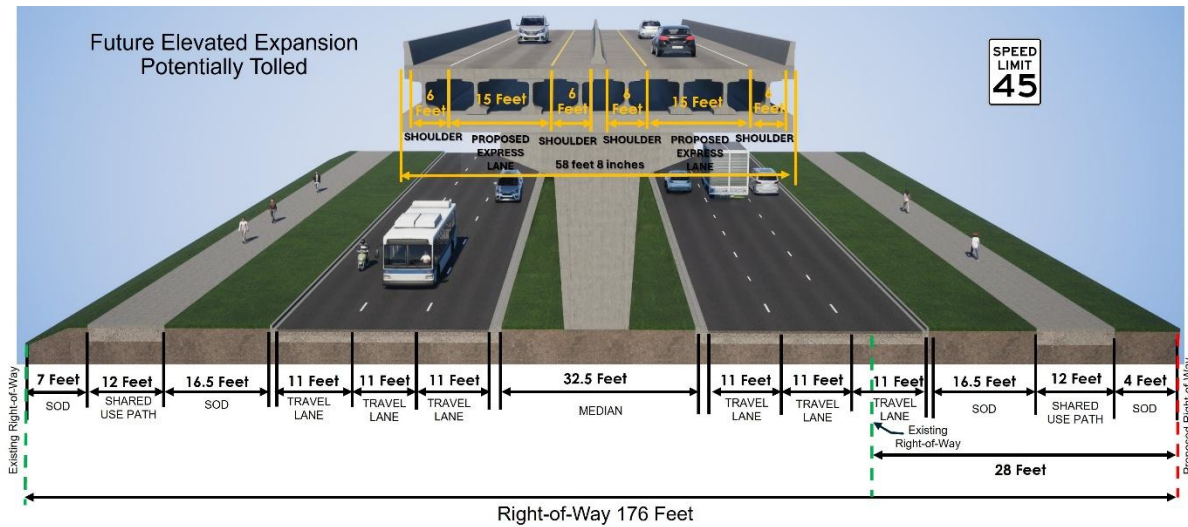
Preferred Roadway Typical Section: South of DeSoto Bridge
